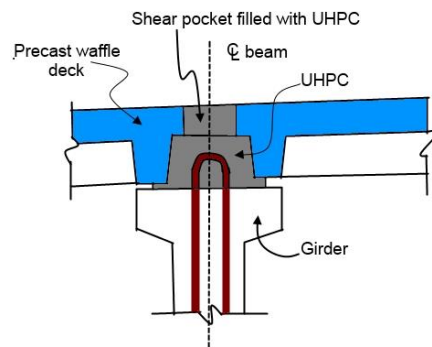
Shear pocket connection details between girder and waffle deck panel
